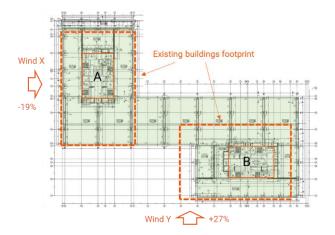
Modification of wind forces – 6b. wind tunnel tests
